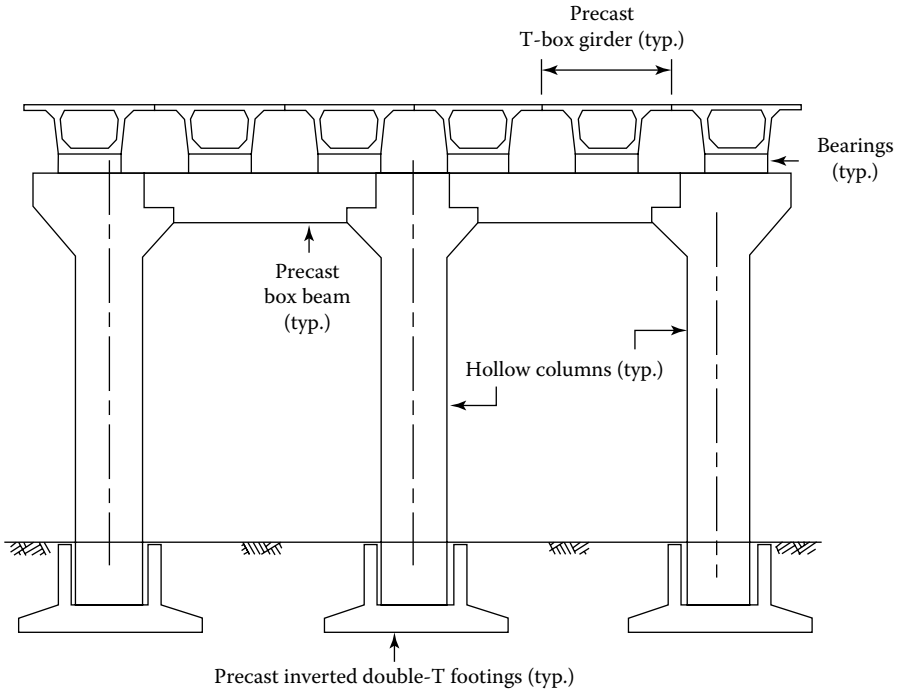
Transverse section of the T-box girder bridge, Queretaro City, Mexico, Mexico.
